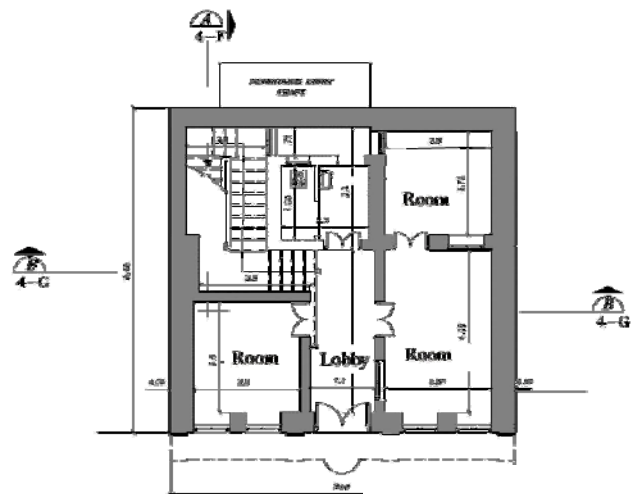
Bayt Al-Najjarīn: Ground floor plan
